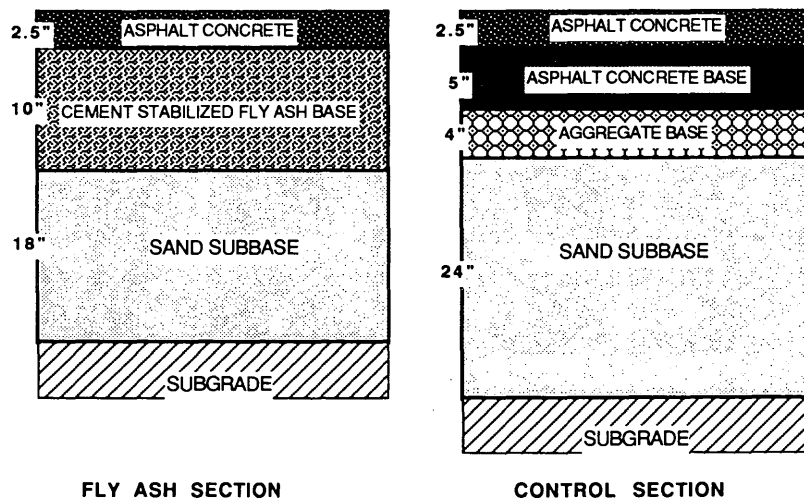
Stratigraphic profile of fly ash test section and control section.
